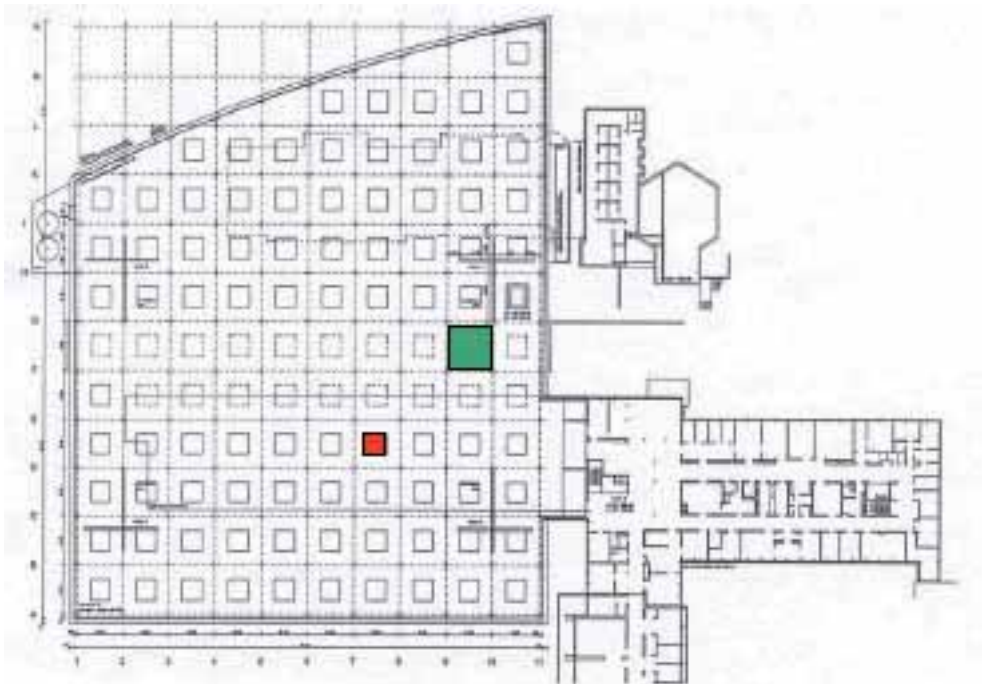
Plan of a typical floor of the primary system, showing an 8.4m x 8.4m structural grid. The primary-system architect was Peter Kamm and Kundig, Architects. This firm had designed one of the pioneering residential open-building projects in Zug, Switzerland, in 1973.
